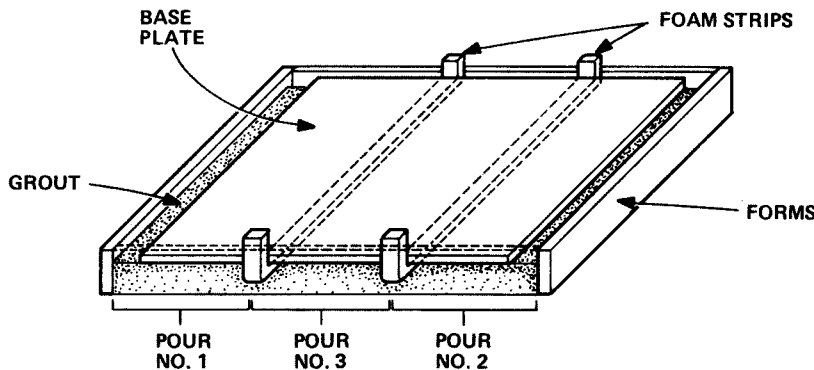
When large areas are grouted, the pour should be divided into sections. Sections 1 and 2 should be poured and allowed to set before the center section is poured.
